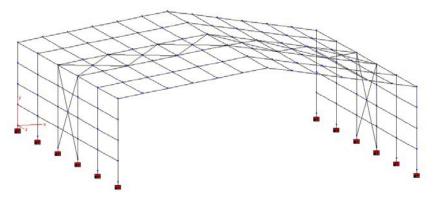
Single bay steel industrial building (3-D view) designed adopting HR sections.
